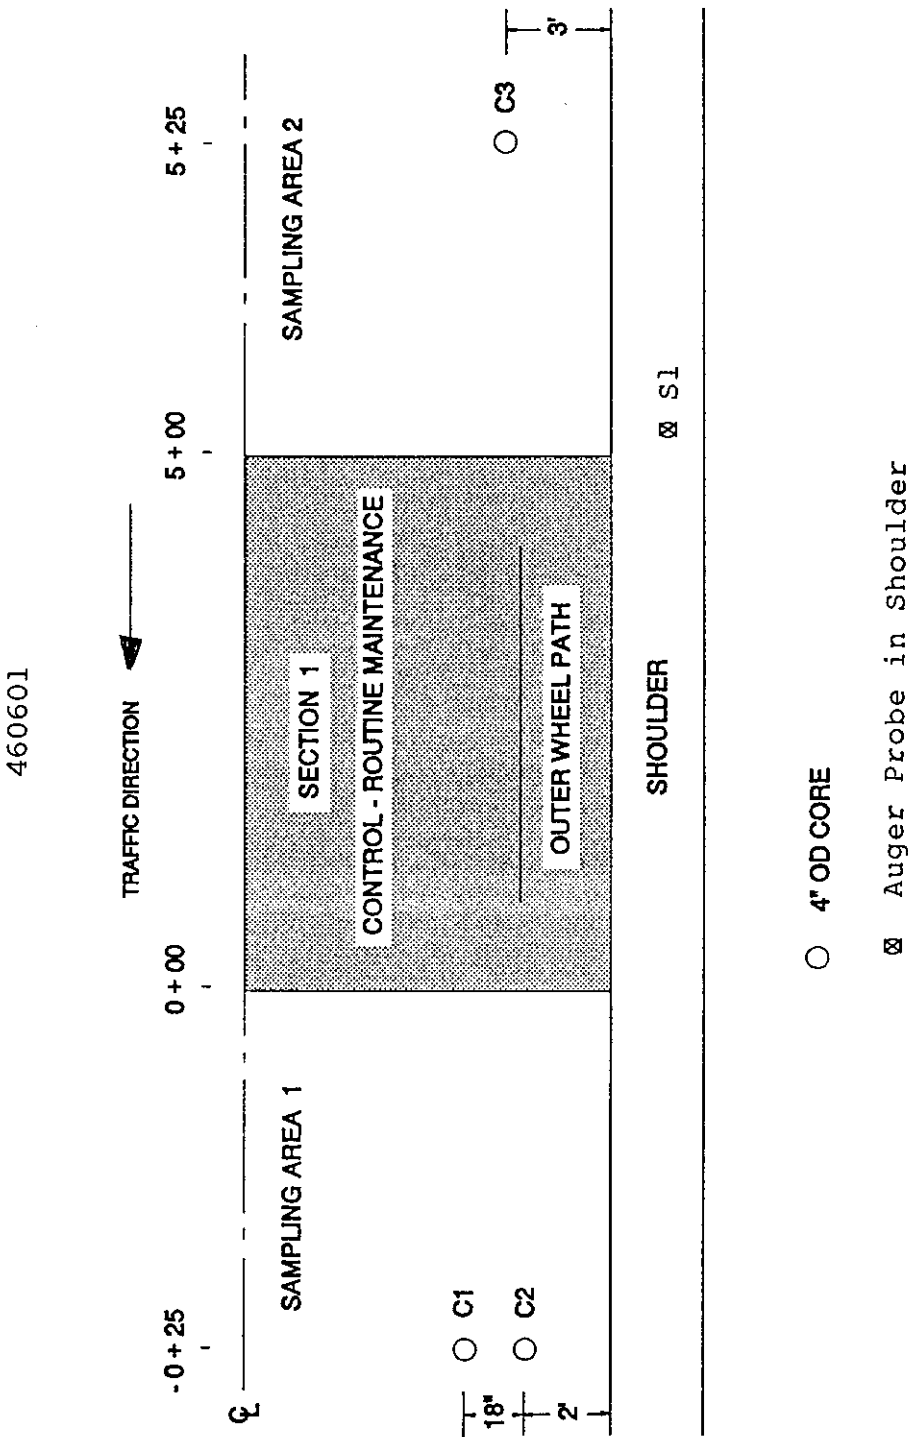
Example of "Pre-Construction" Sampling Plan for Test Section 1
